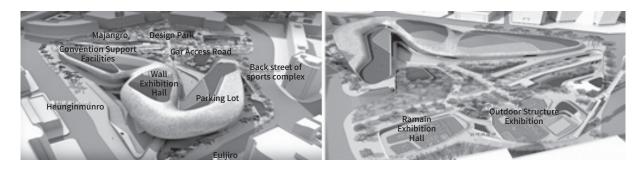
Dongdaemun Design Plaza Plan (Draft)
